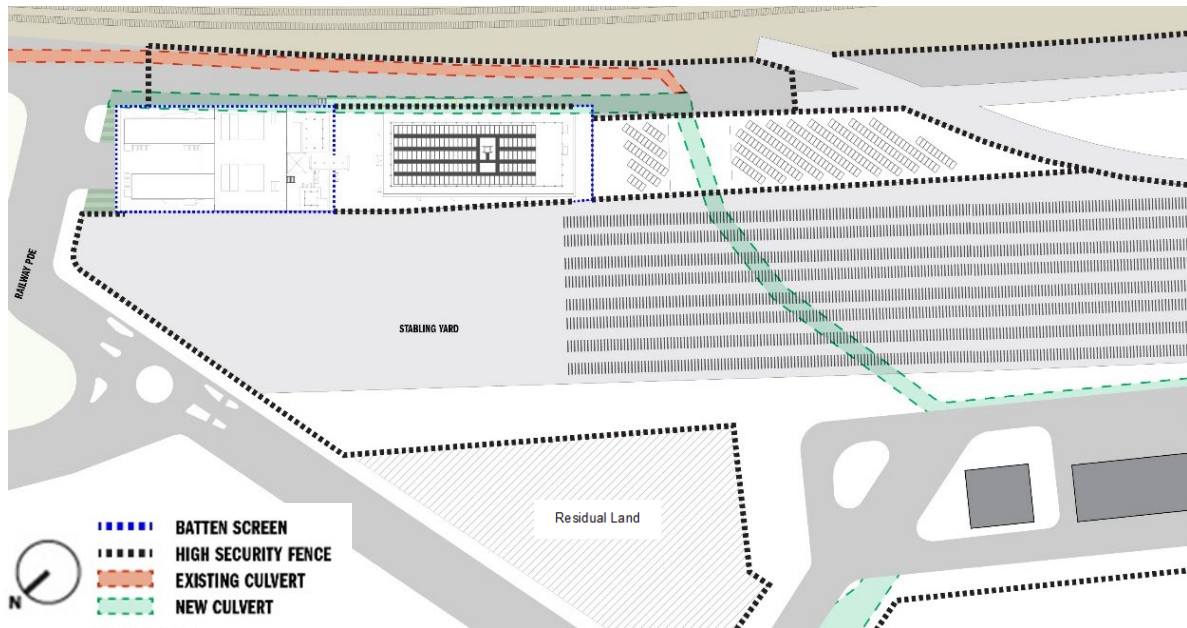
Marrickville Dive – Existing and proposed culverts
